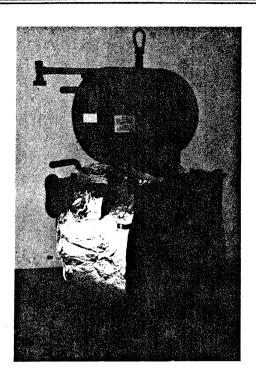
Place insulation (sheet 3) on top of the piping (Boiler).
